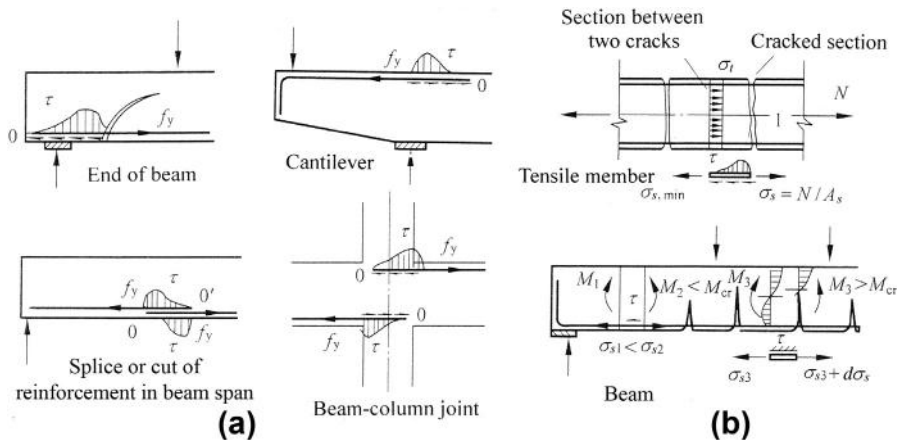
Two categories of bond stress state: (a) anchorage bond of reinforcement end, (b) bond between cracks
